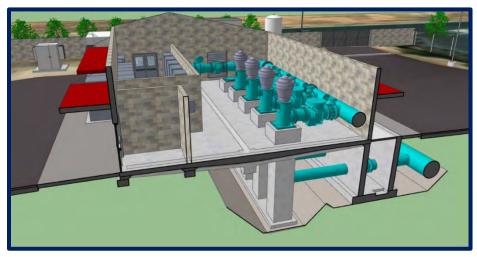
Isometric section view of the booster pump station building. AUBURN utilizes 3D modeling techniques to collaborate with the project team to refine work plans, discover conflicts before they happen, and provide better prospective on upcoming work. AUBURN personnel will bring this same competency to the Design-Assist team.
